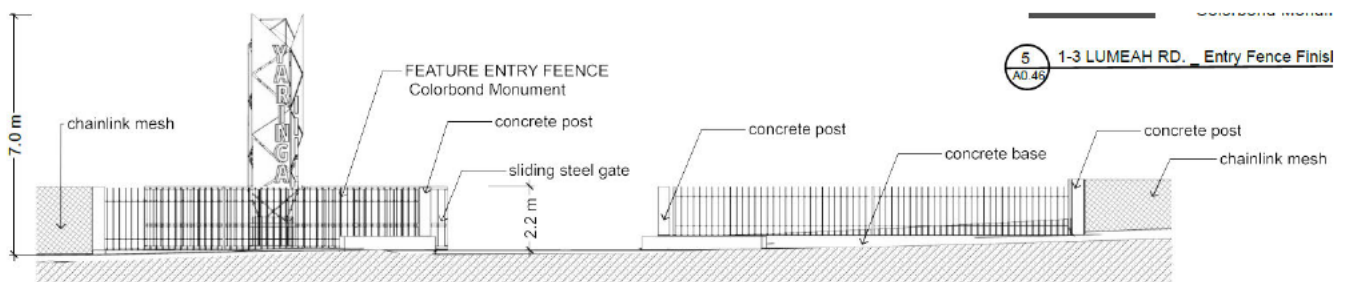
Front fence elevation for 3-5 Lumeah Road
